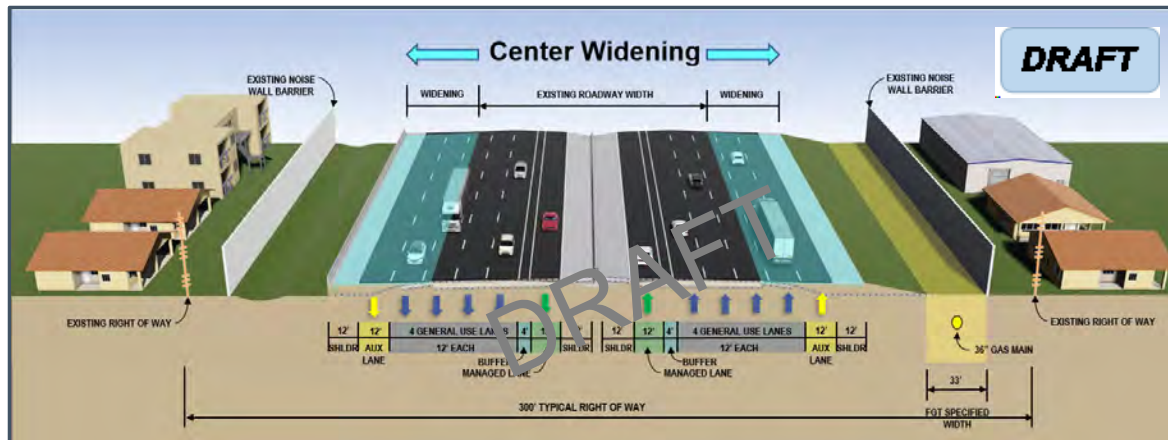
Proposed Typical Section (South of I-595 to South of Atlantic Boulevard)
